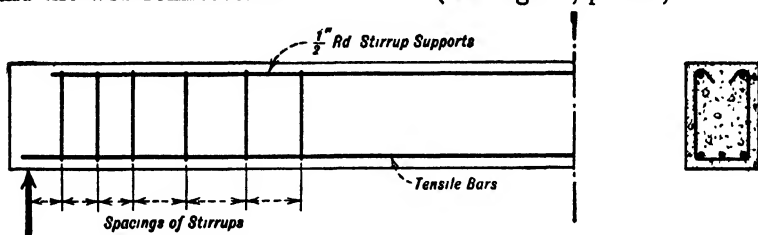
Spacing of Stirrup. (See p. 248.)
